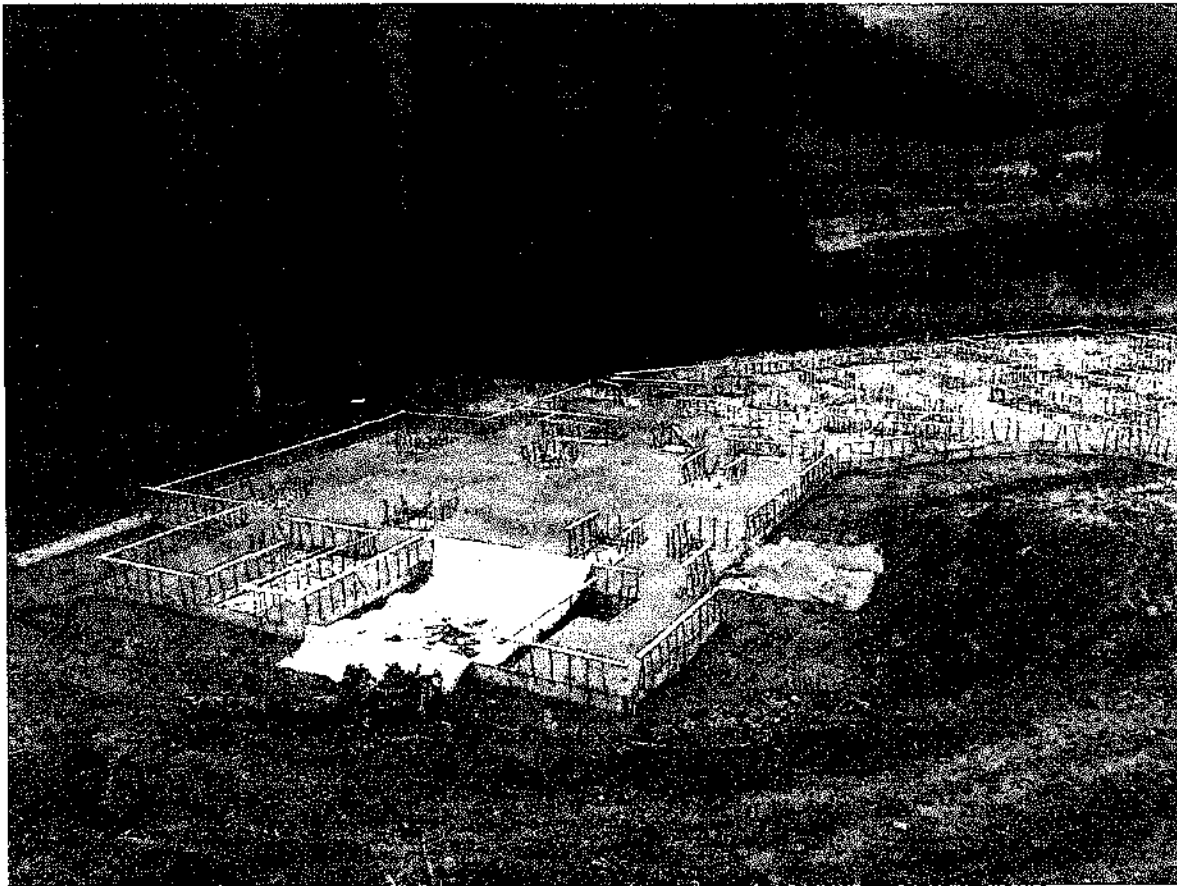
First floor slab of the service building at the resort base (From EAO Environmental Assessment Office – Substantially Start Site Inspection, October 13, 2014)
